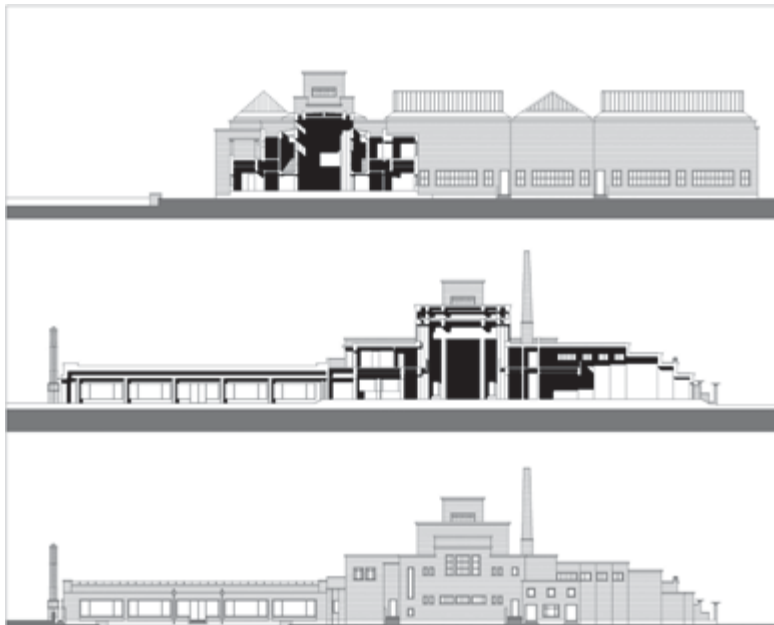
Alessandro Dalla Caneva, section and elevations of the Kunstmuseum Den Haag
